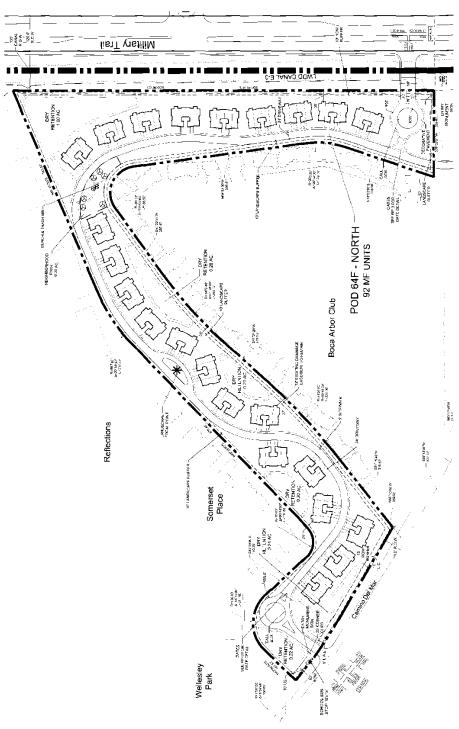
Preliminary Subdivision Plan dated July 13, 2011 page 6 of 7
